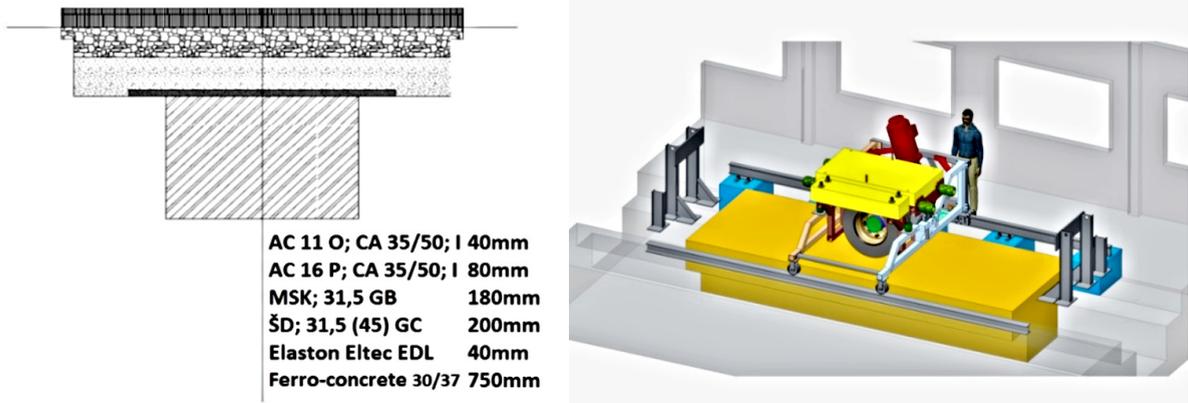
(a) Accelerated Pavement Testing Facility of the University of Žilina - cross section of pavement test field, (b) design of the facility.
